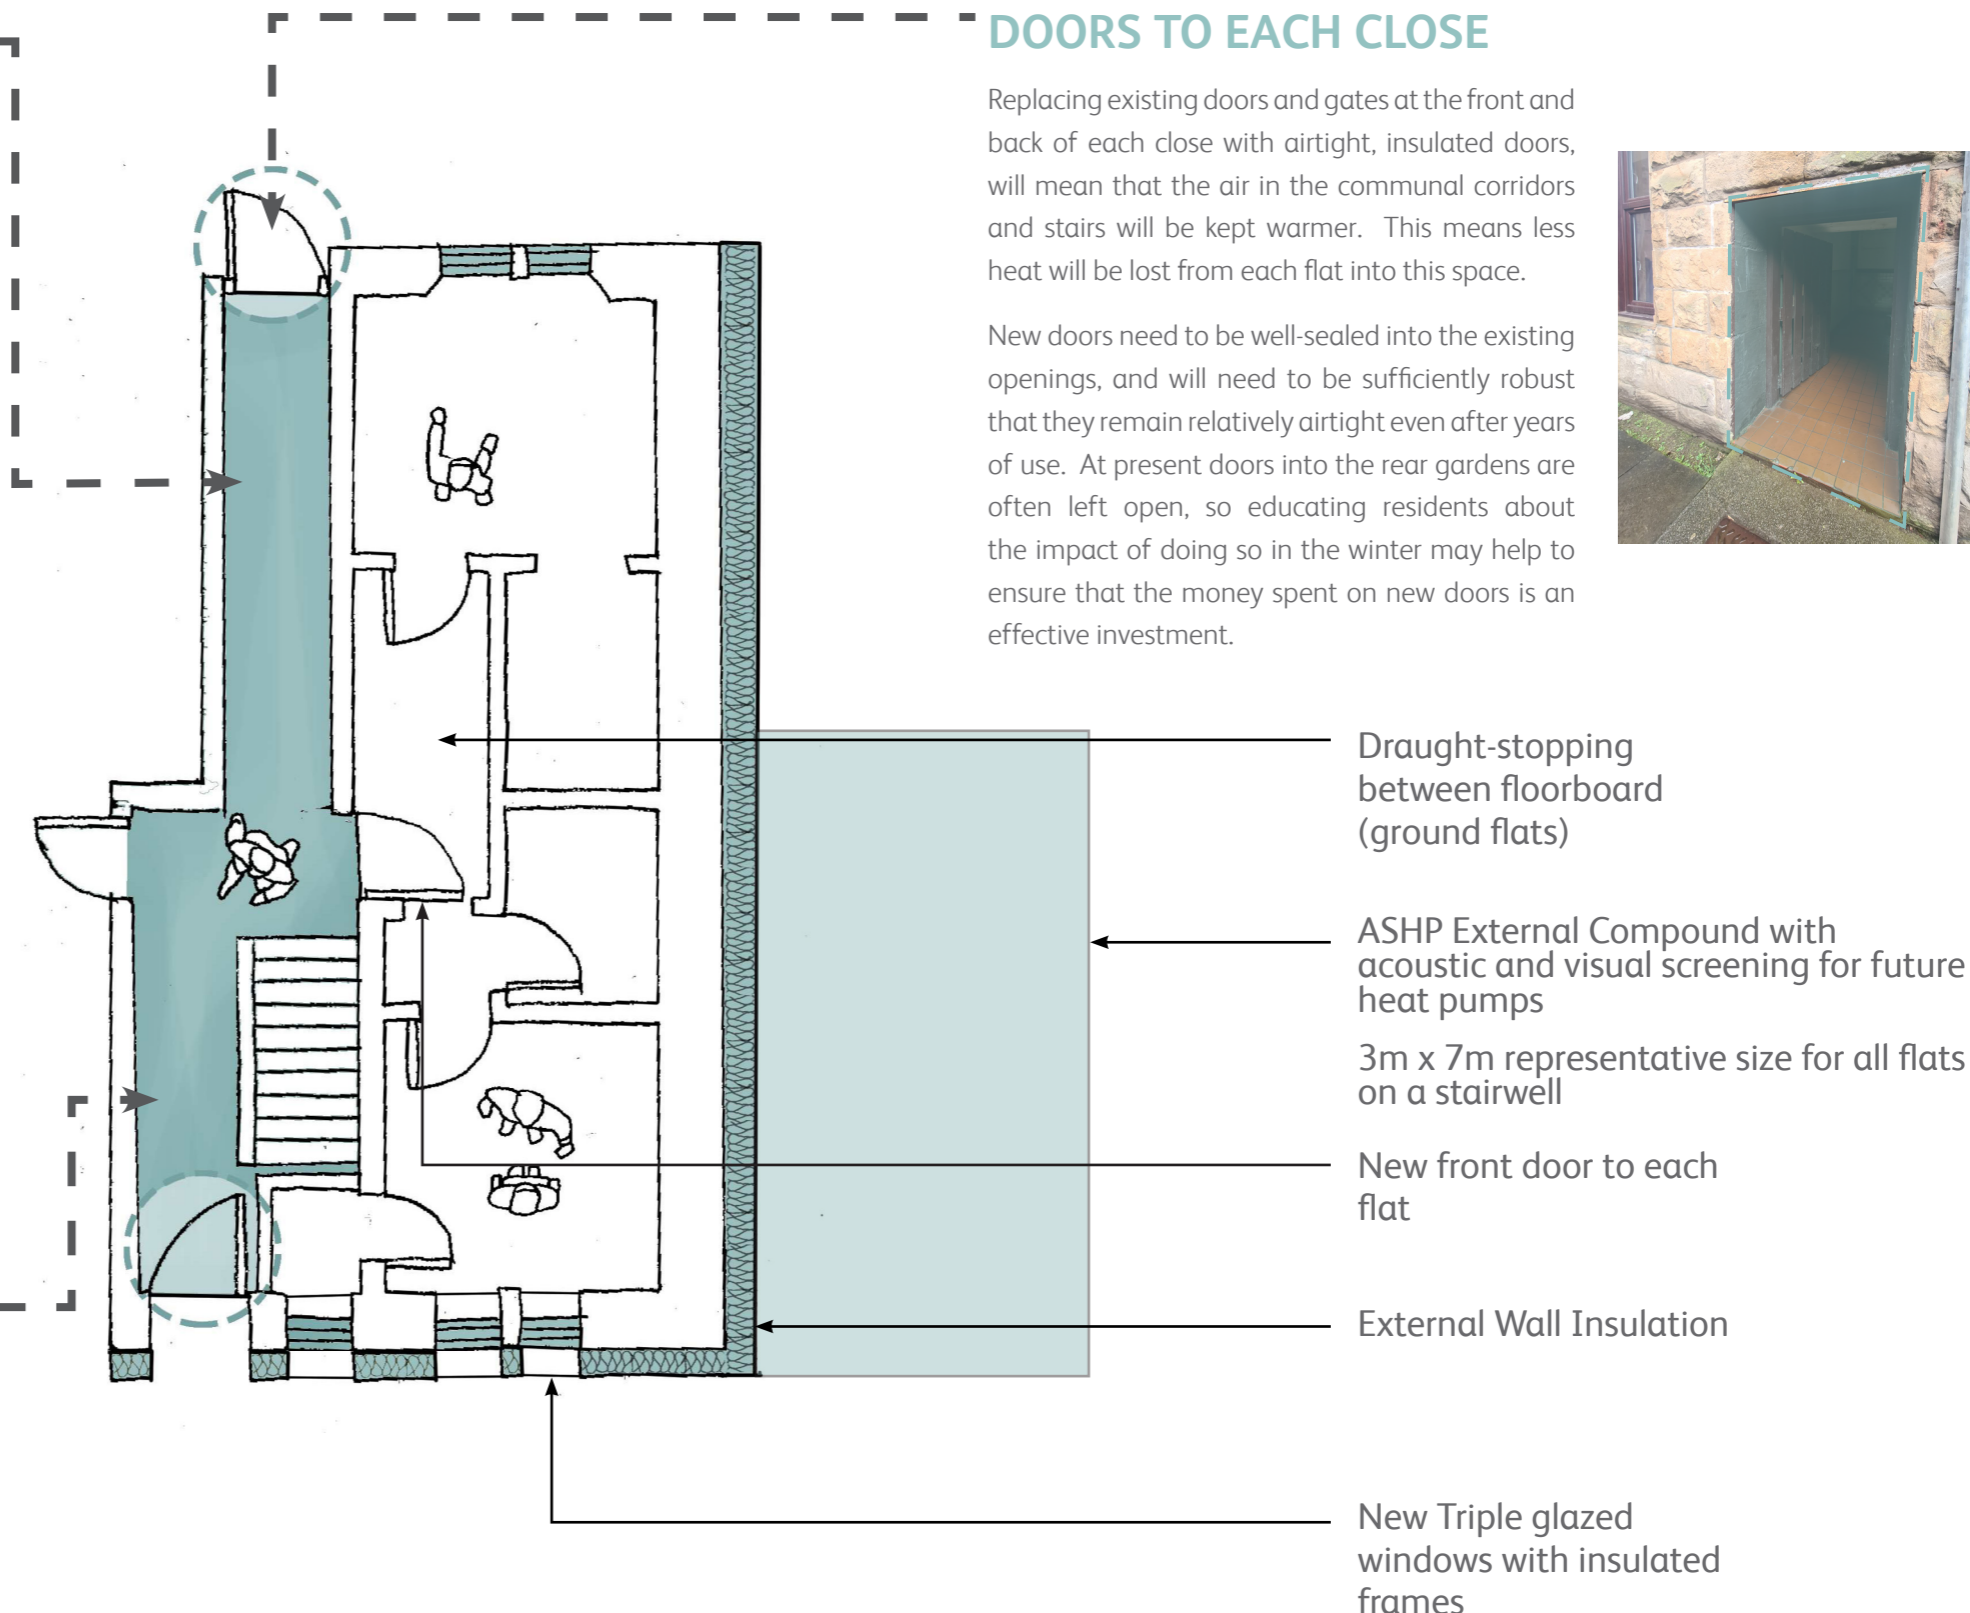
Floor Plan of typical ground floor flat showing communal and external works done with residents in situ
